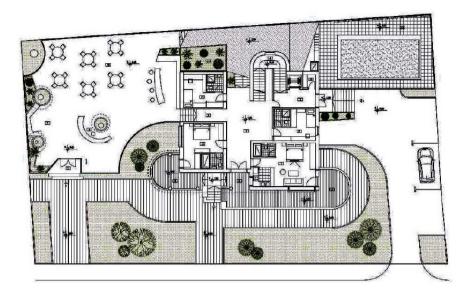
Villa Živković, new design proposal- ground floor plan.
